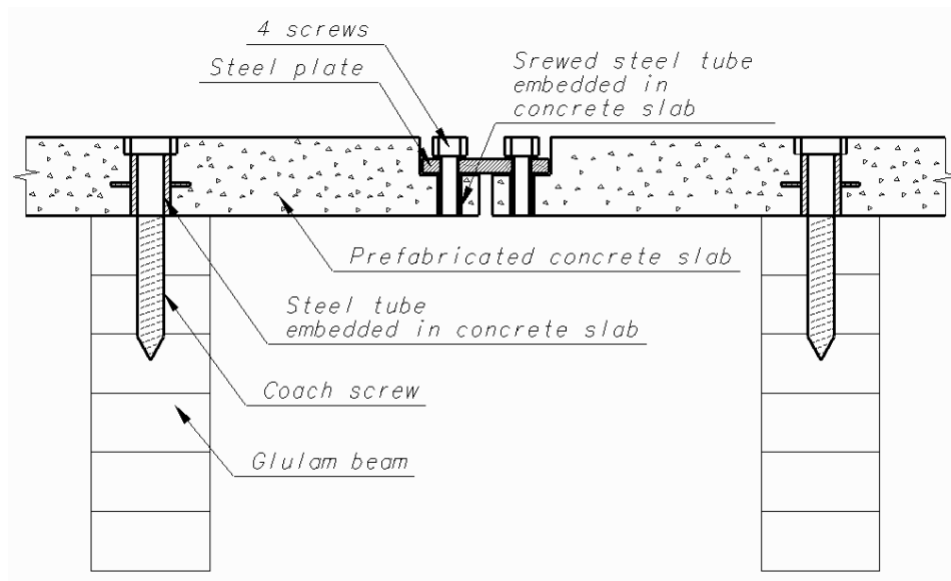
Cross-Section of Fully Prefabricated TCC Floor System
